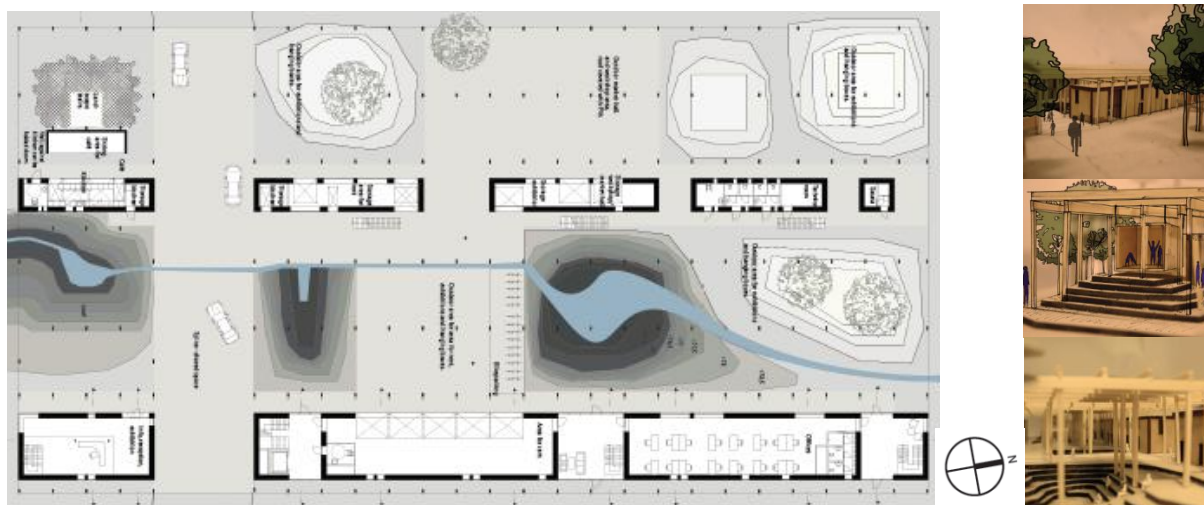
Location plan with building plan and outdoor areas (on the right). Images of the area (on the left side).
